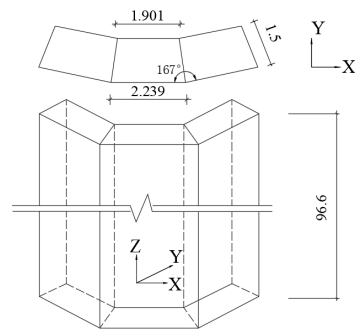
Schematic diagram of double-angled trench wall (unit: m).
